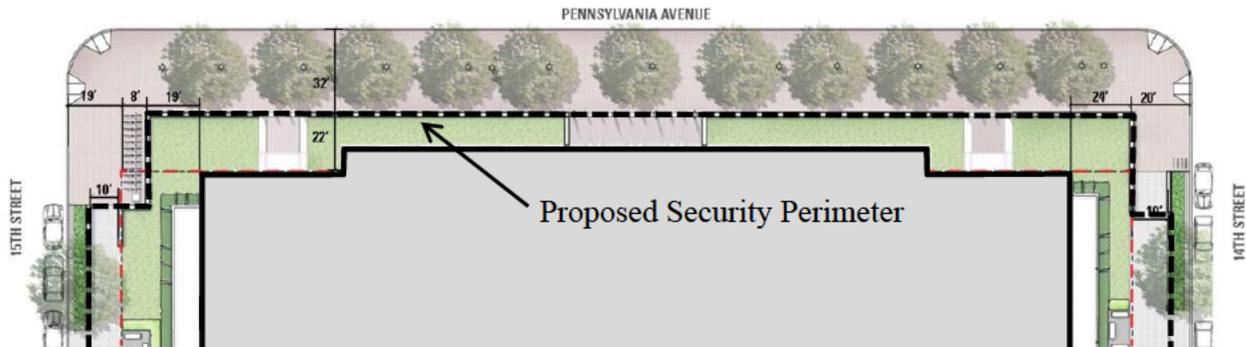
White House Visitor's Center Entrance, Pennsylvania Avenue – Site Plan
